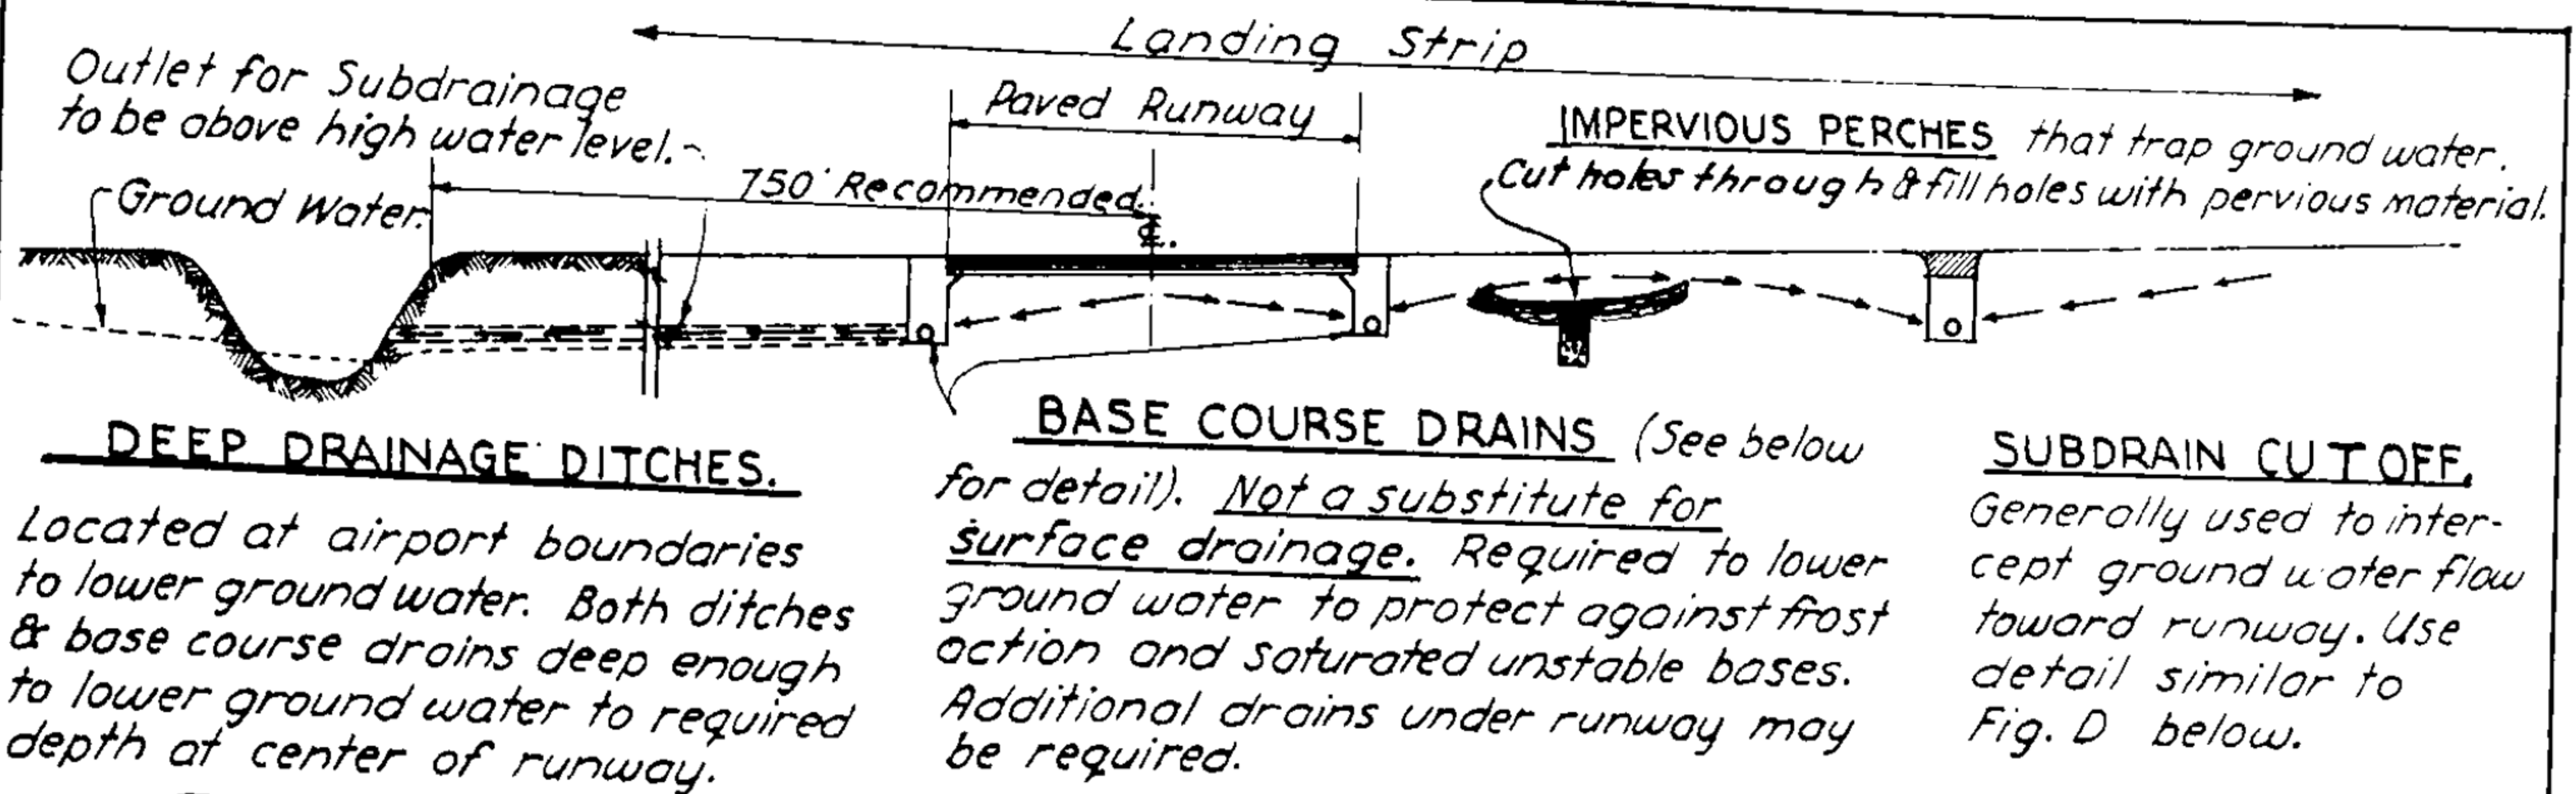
FIG. A - SUBDRAINAGE TO LOWER GROUND WATER.
